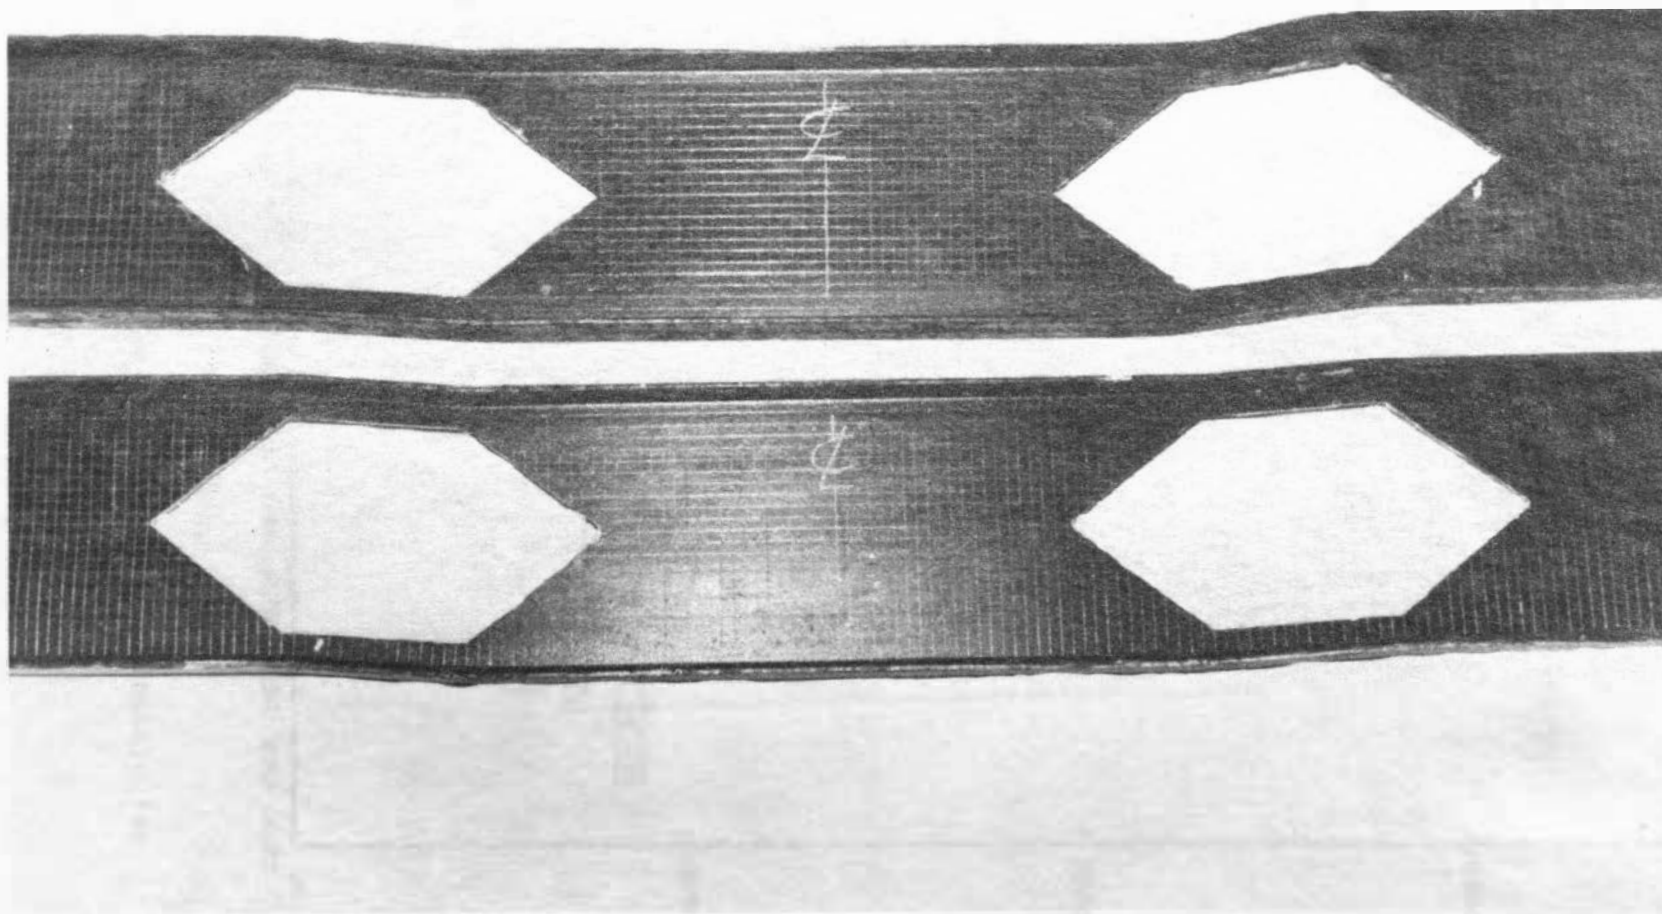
Front View of Specimens B-1 and B-2 After Testing
